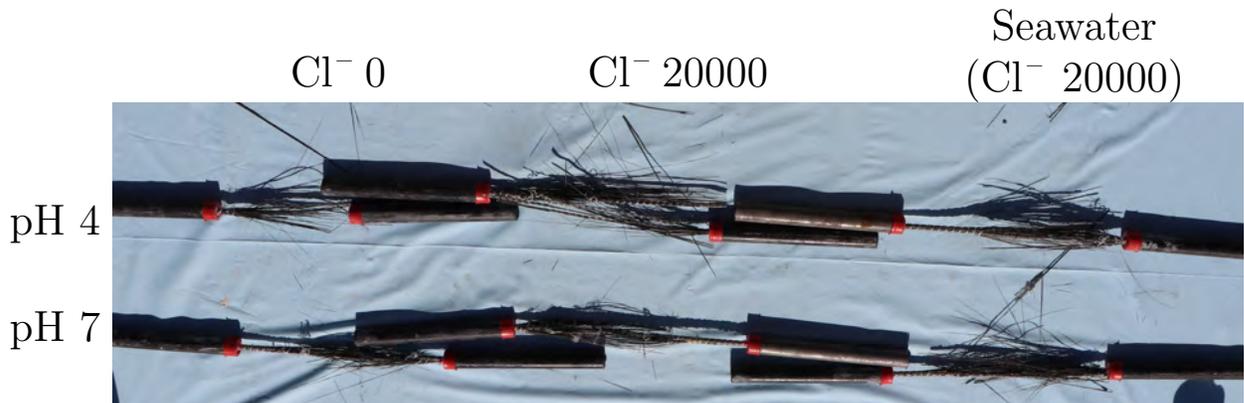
Tensile test failure mode of Type A # 3 rebars
